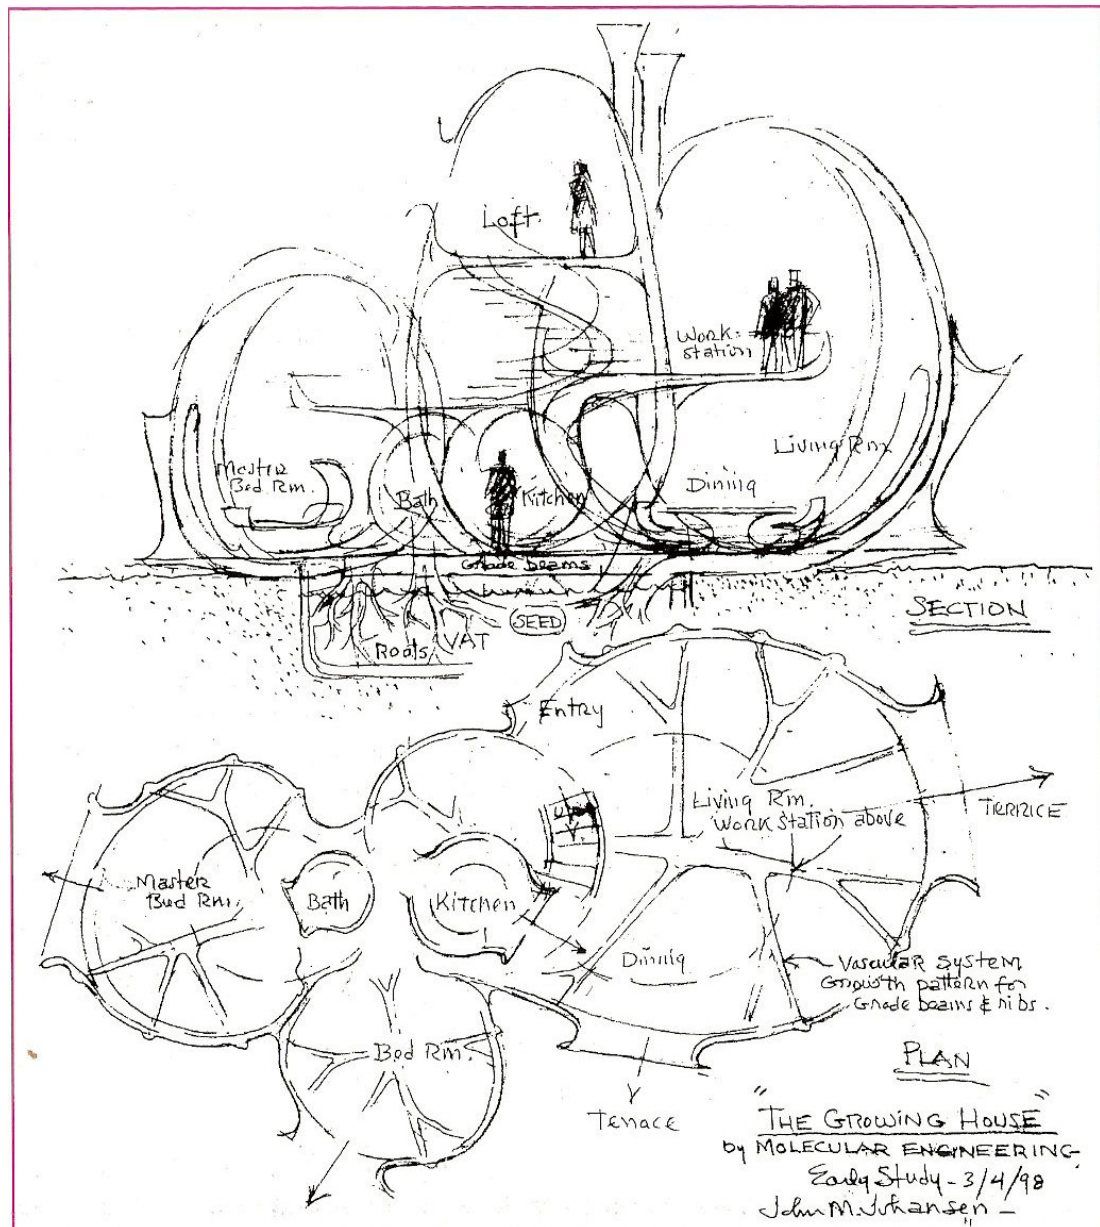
The Growing House- Plan and Section, Early drafts, John M. Johansen, 1998.
